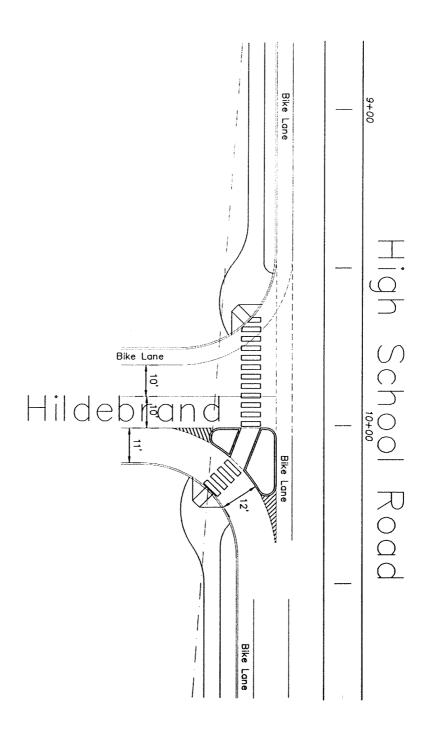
Phase 1 High School Road/Hildebrand Intersection Modifications
